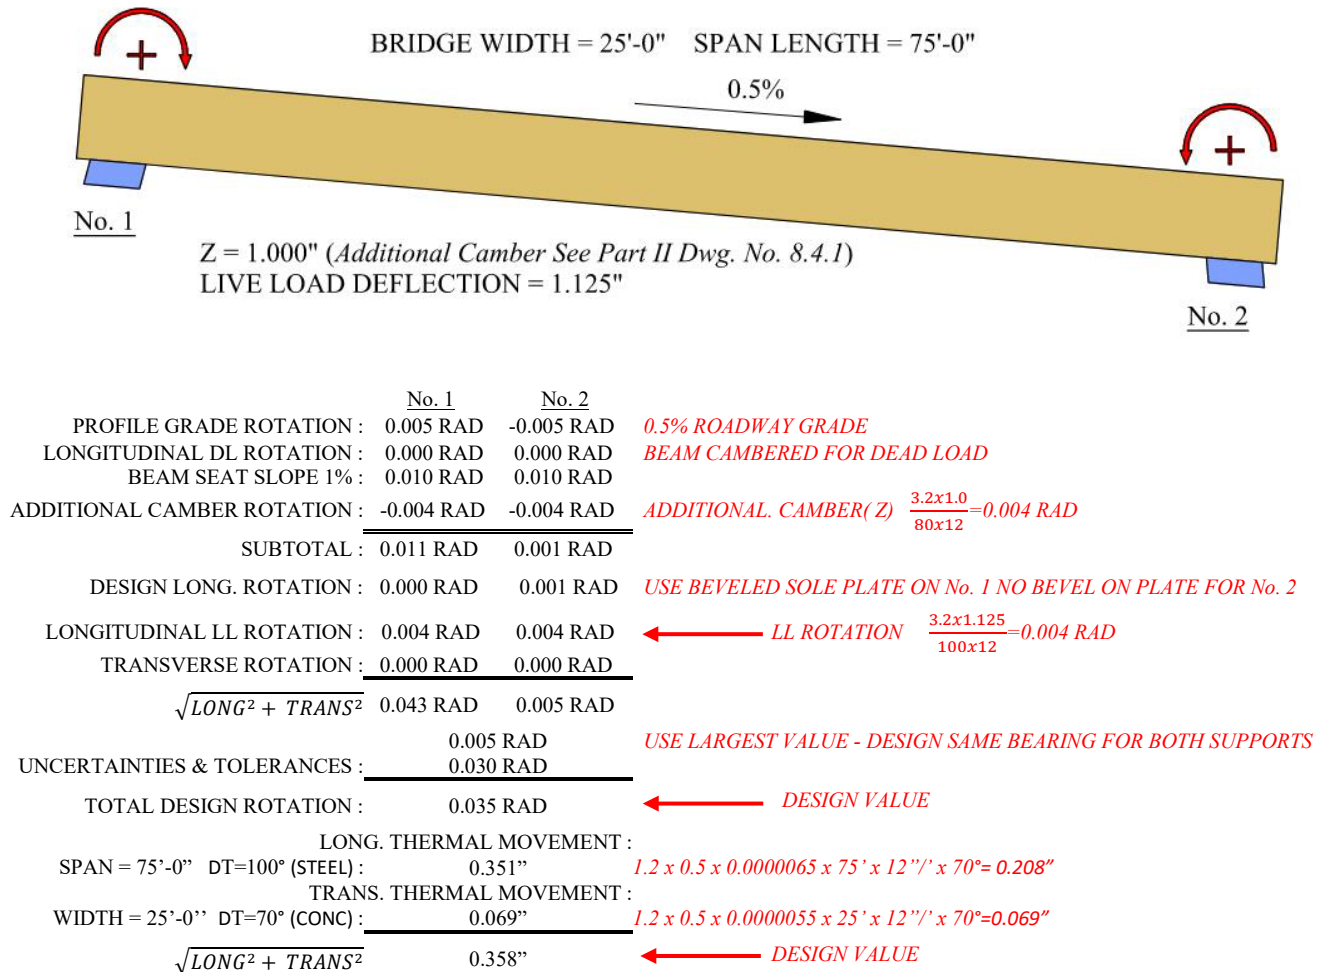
Bearing Design Forces and their Direction
